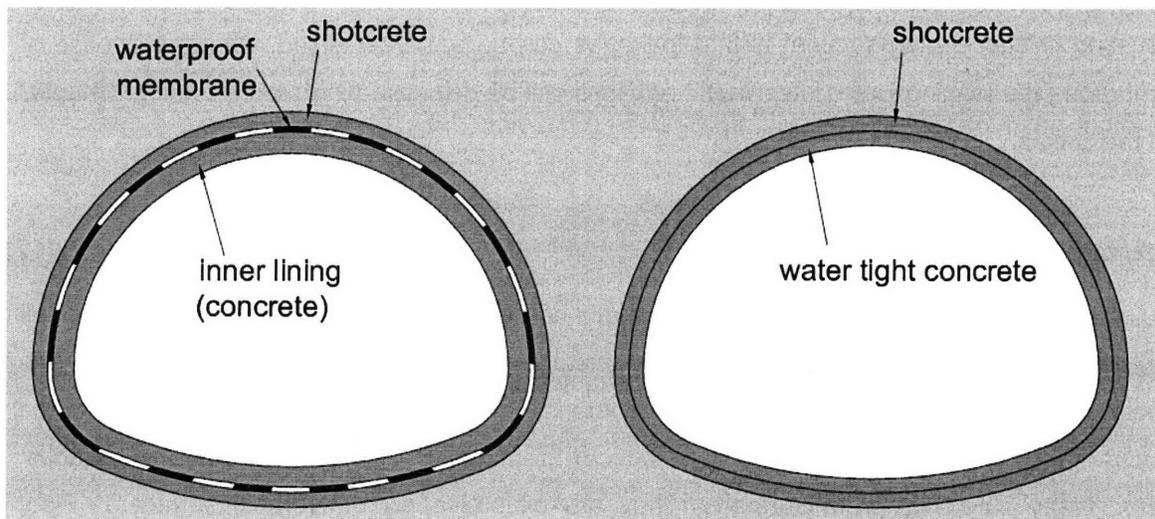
, Principles of Tunnel Waterproofing, (Kolymbas 2005)
